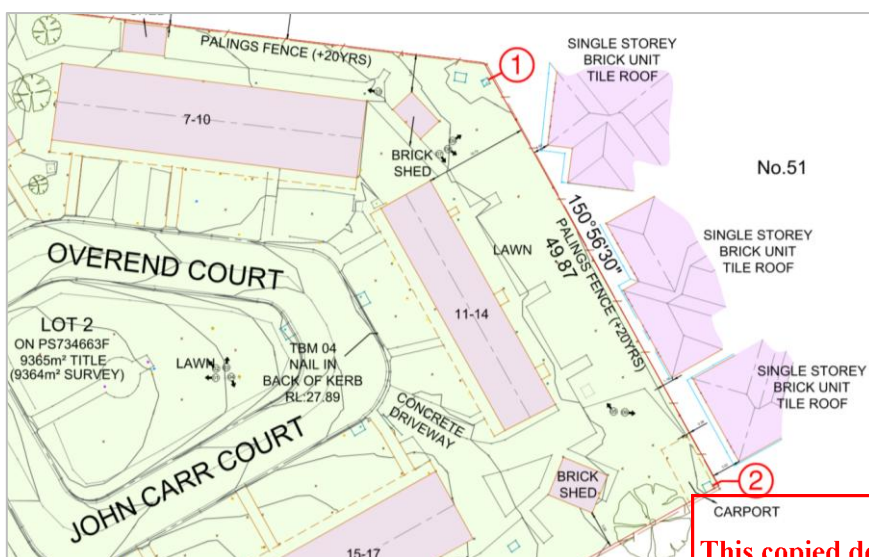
Location of existing drainage pits (Feature Survey, March 2025)
